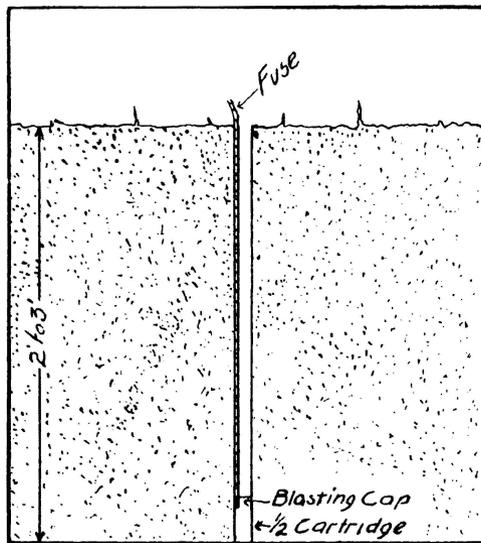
Method of Loading for Sub-soiling and Tree Planting
